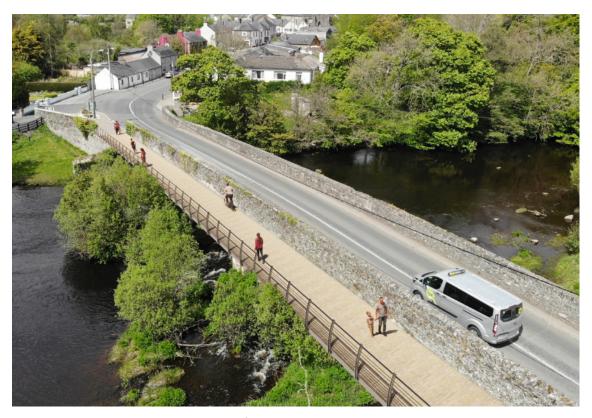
CGI Images of potential Cycleway and Footbridge Boardwalk
